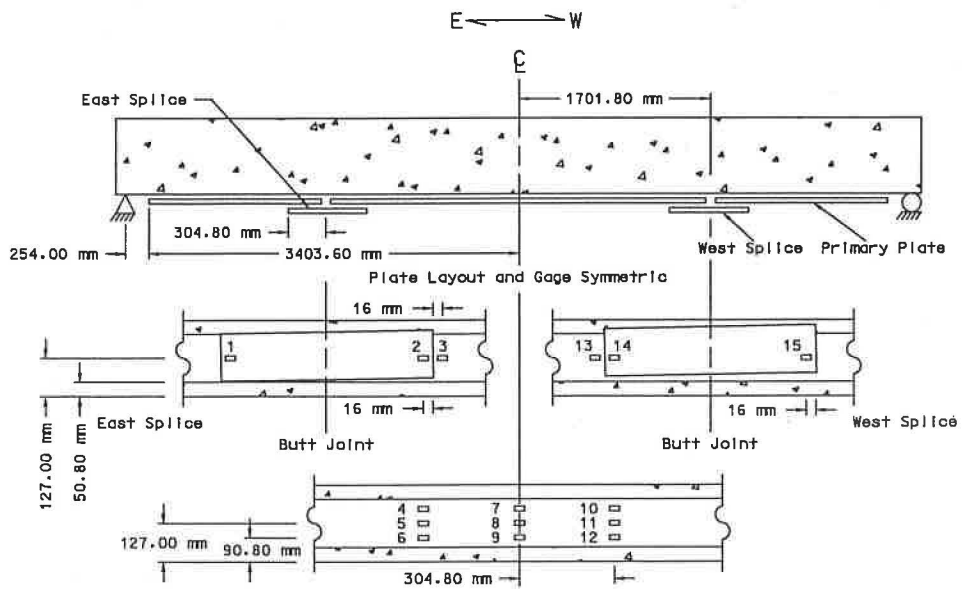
CFRP Plate Layout and Gage Locations, Beam 8 (ULT)
